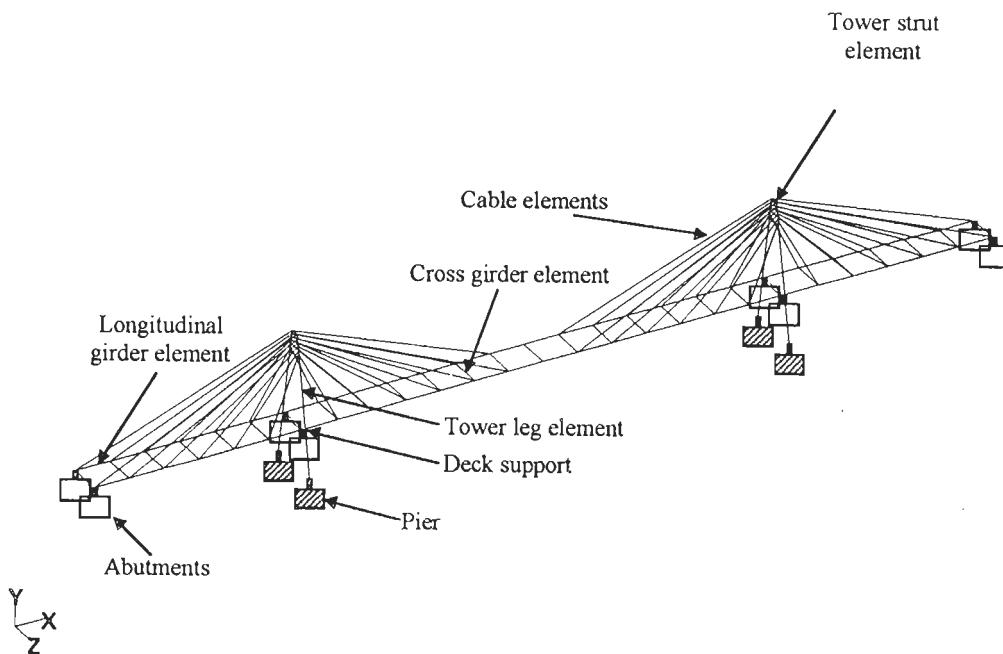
Idealization of Cable Stayed Bridge as a Three-Dimensional Space Structure
